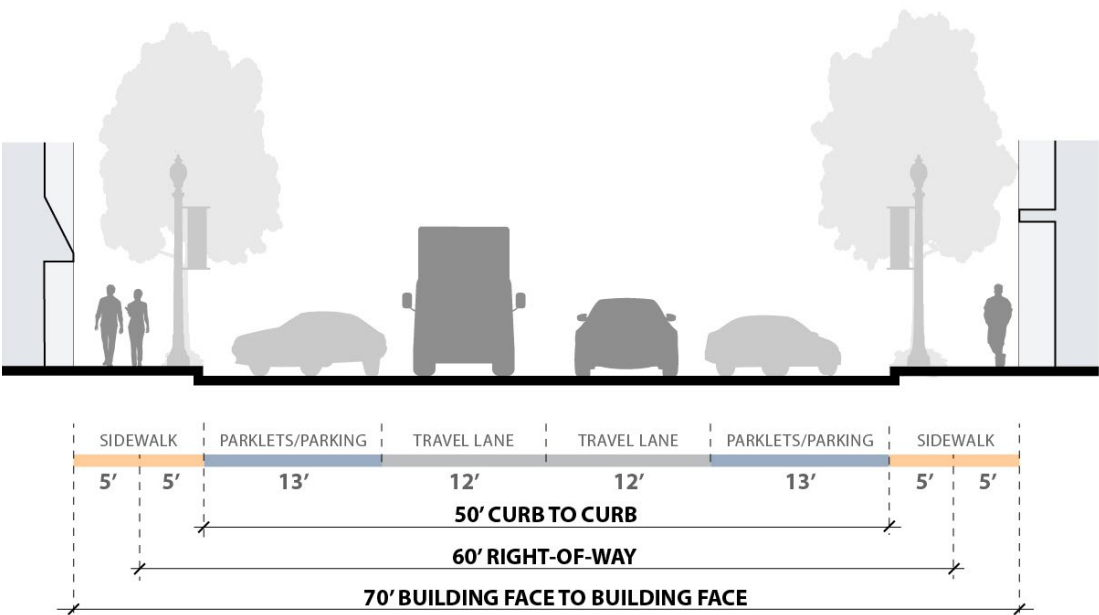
EXISTING STREET CONDITION: LAUREL STREET 600, 700, AND 800 BLOCKS (LOOKING NORTH)
